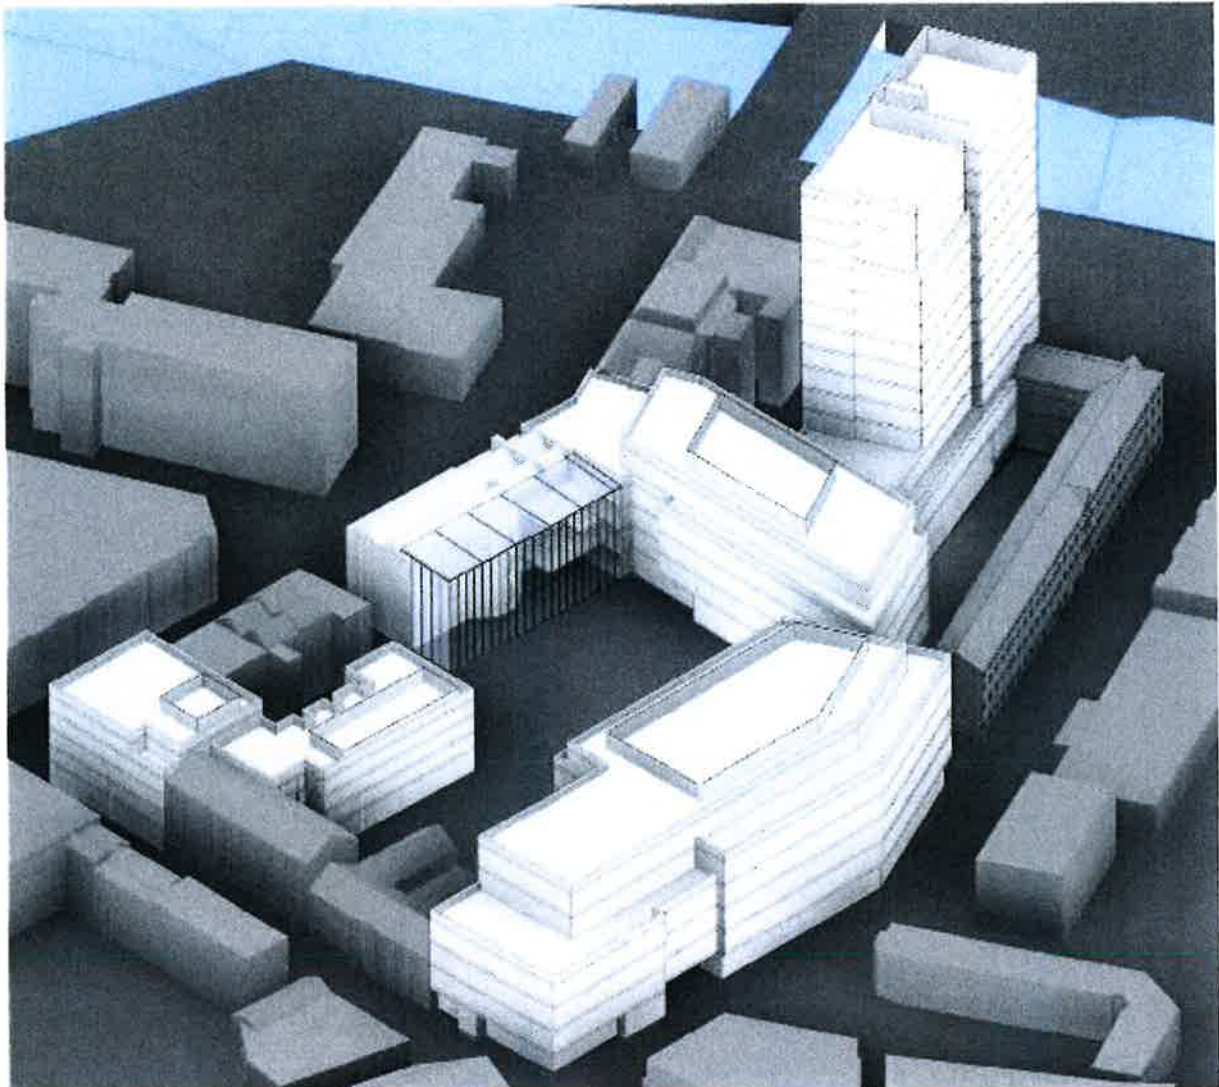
Model photograph from developer's planning documentation showing Parcel 6 replacement building on Granary section (upper right section of picture) completely dwarfed by both the tower block building and other new buildings in the proposed development.
